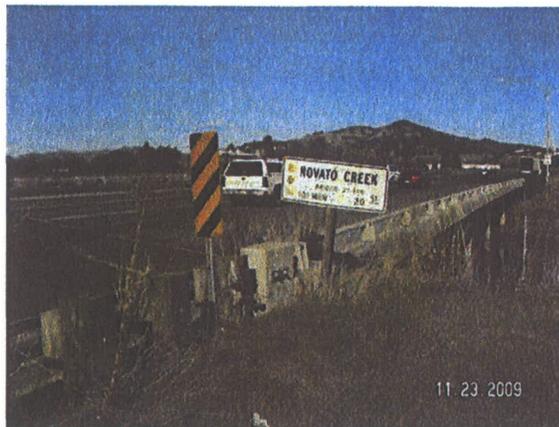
Novato Creek Bridge, northbound SR 101 (Bridge No. 27-0089R)
